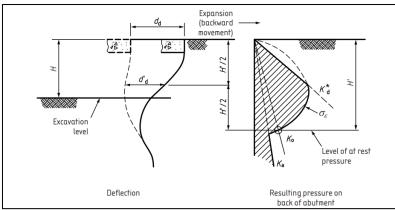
Earth pressures applied to the back of abutment (expansion case) ^[7].
